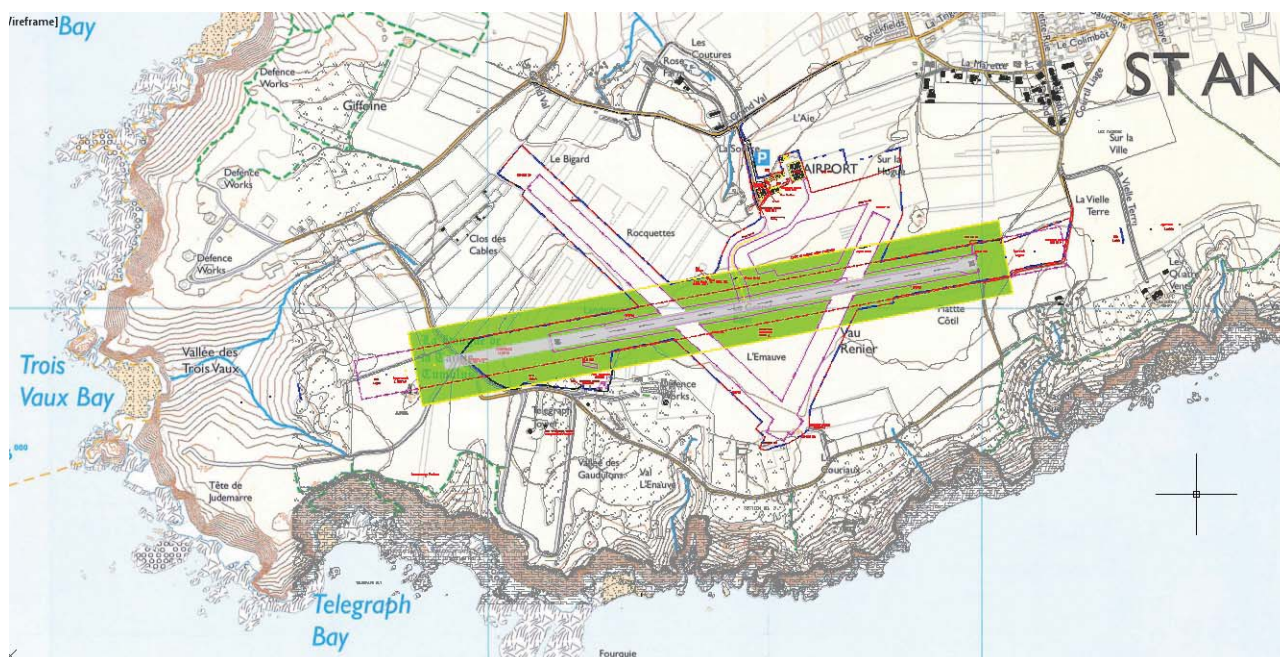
Discussion option – Runway 08/26 1100m long, on existing alignment extended westward
